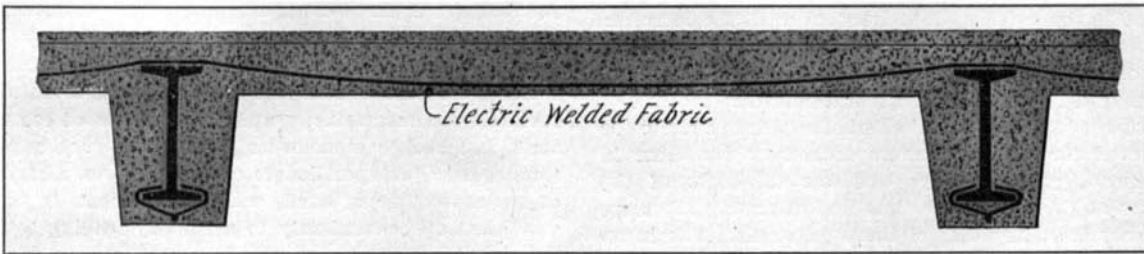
Clinton System Using Electrically Welded Fabric.
